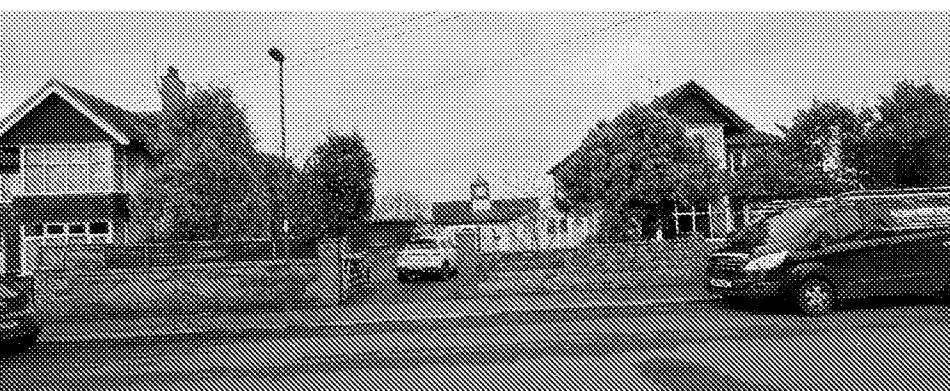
Streetscene View of Application Site Frontage onto Nelson Road
